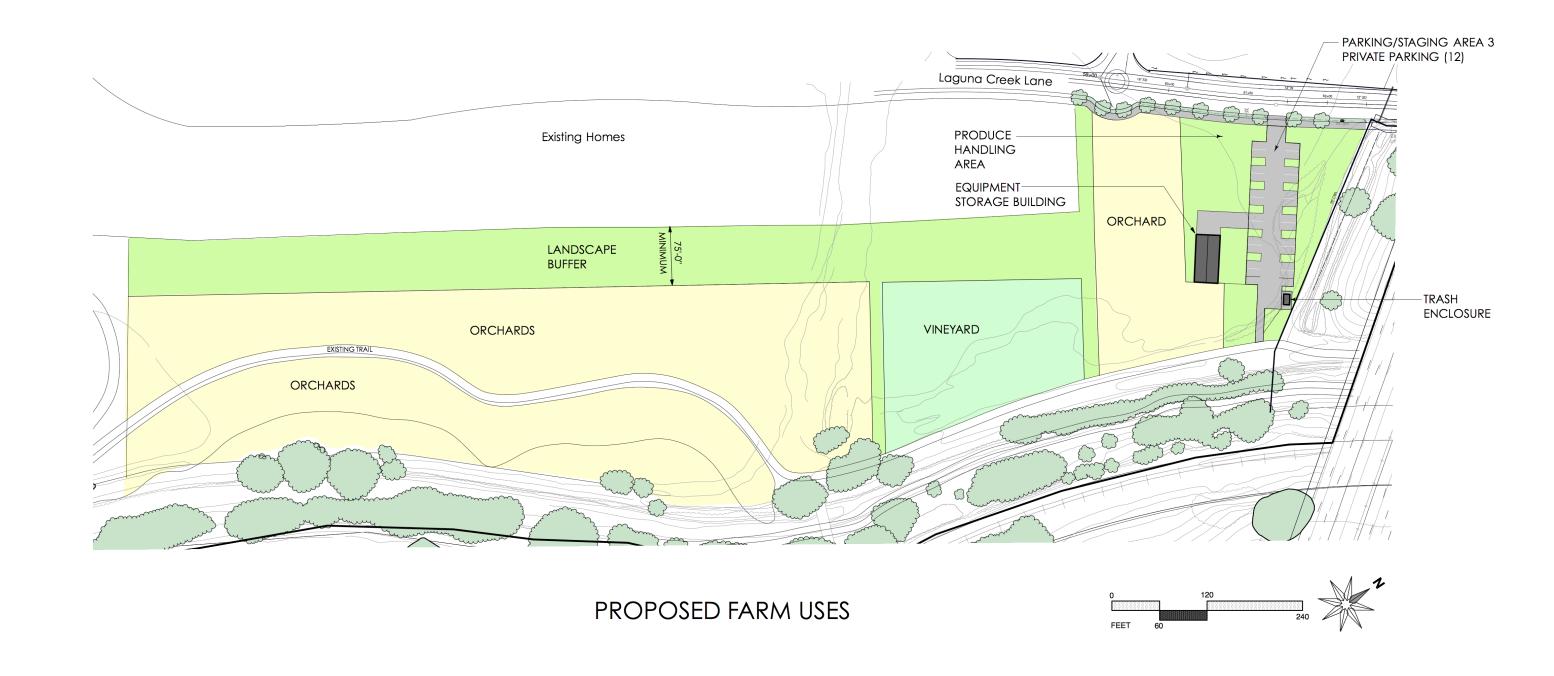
SUB-AREA 16 - PROPOSED SITE PLAN
